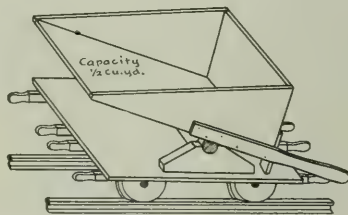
Dump Boxes for Placing Concrete in Shafts of Piers.
